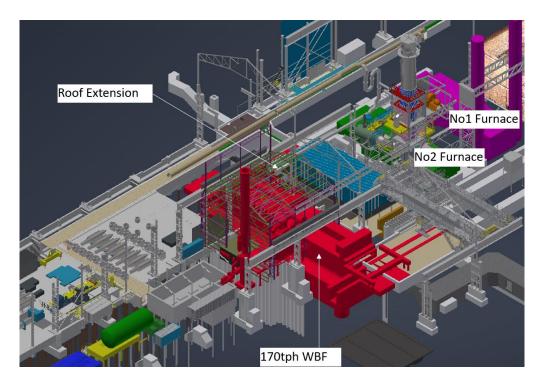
Conceptual 3D Model of new Walking Beam Furnace (in red)
